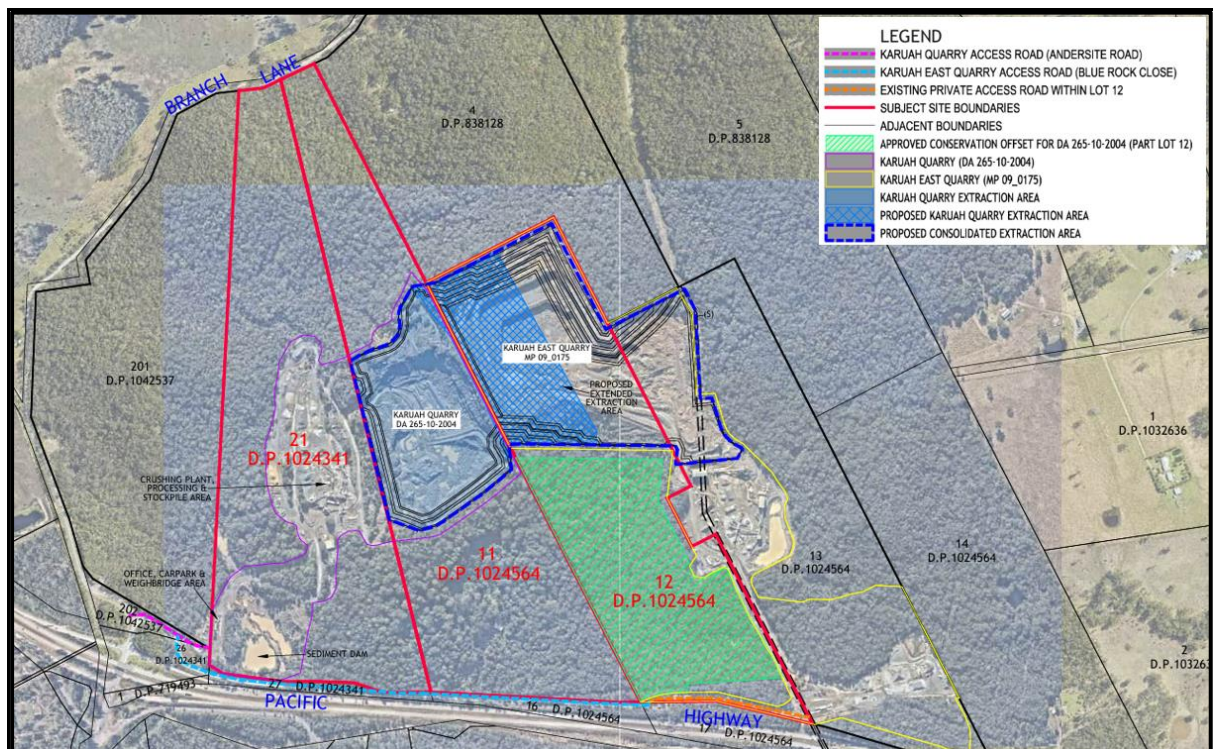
Extract of Proposed Site Plan for Karuah Hard Rock Quarry.
